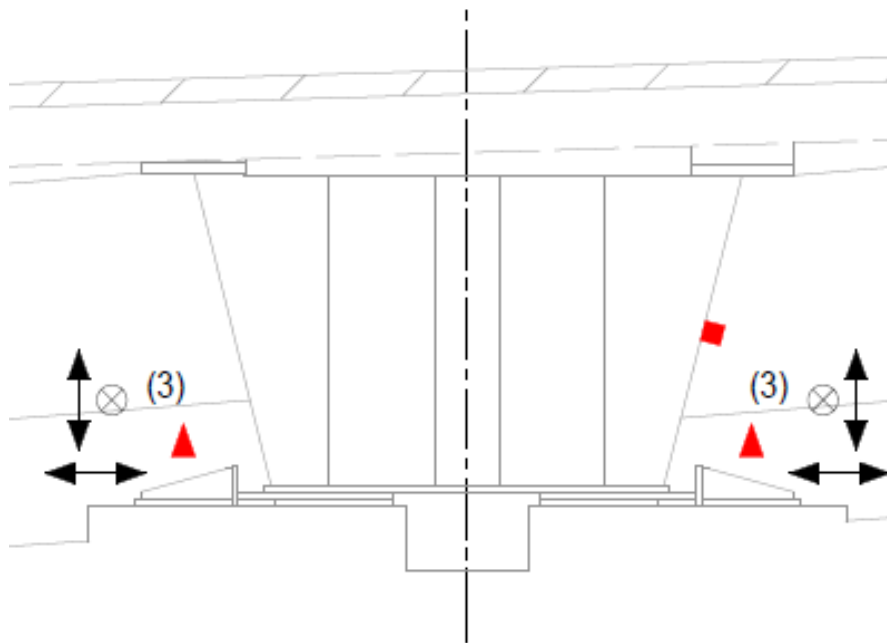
Cross-sectional view of Steeles Avenue bridge girder, including bearing positions
